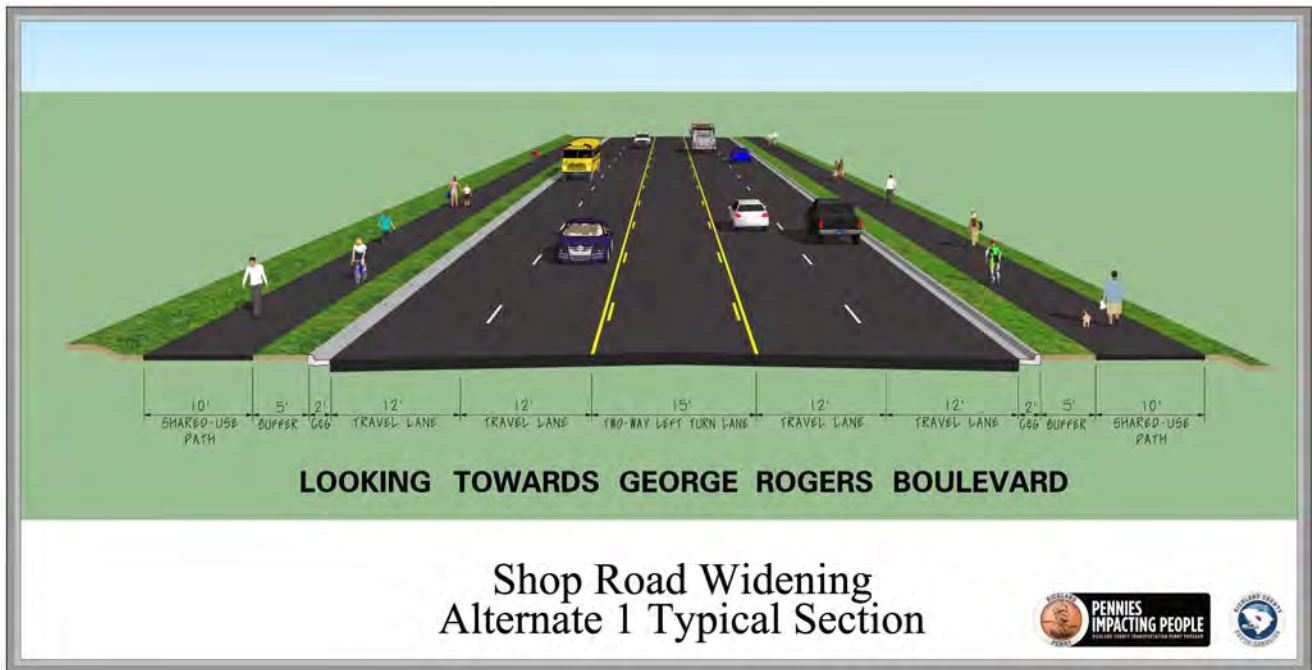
Exhibit C – Shop Road (S-727) Widening Recommended Typical Section
